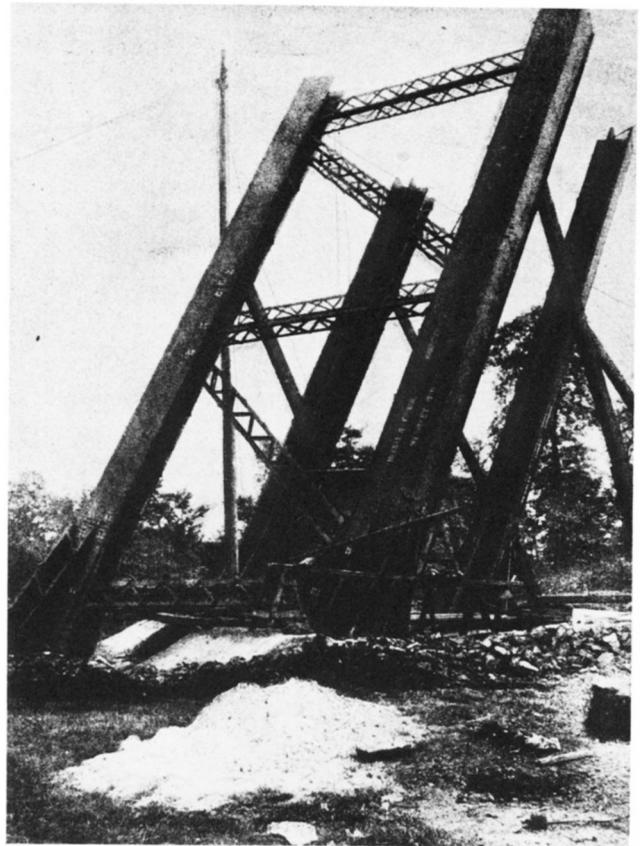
The Wembley Park Tower under construction, 1893 (*The Engineer*, September 1893).
